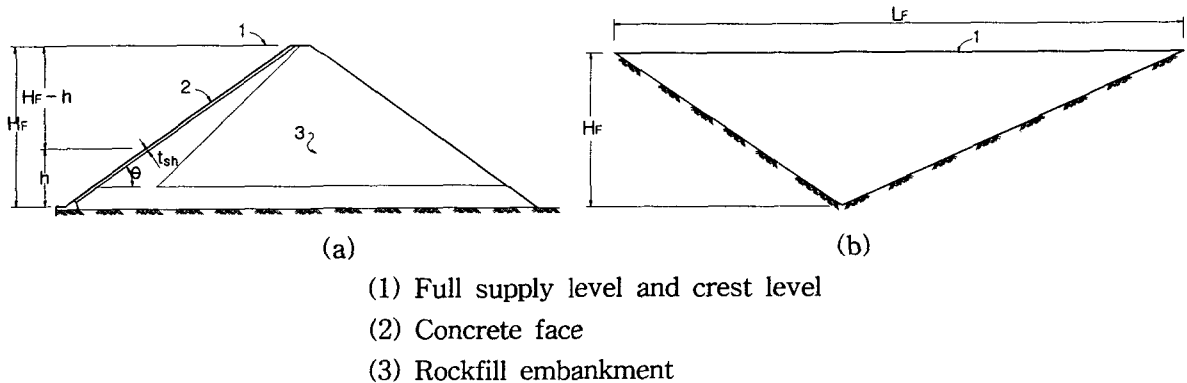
Idealised Form of Dam (a) Cross section (b) Elevation of Dam
